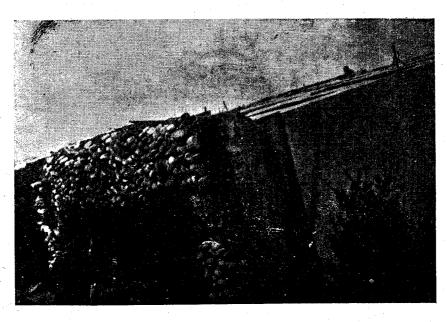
Overturned Apartment at Niigata Showing the Foundation Stones
